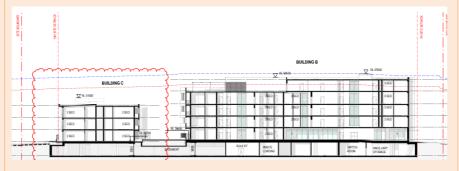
Extract from amended drawing DA301B Section 03 with Randwick Close on the left and Kurrajong Road on the right, through Building C on the left and Building B on the right.
